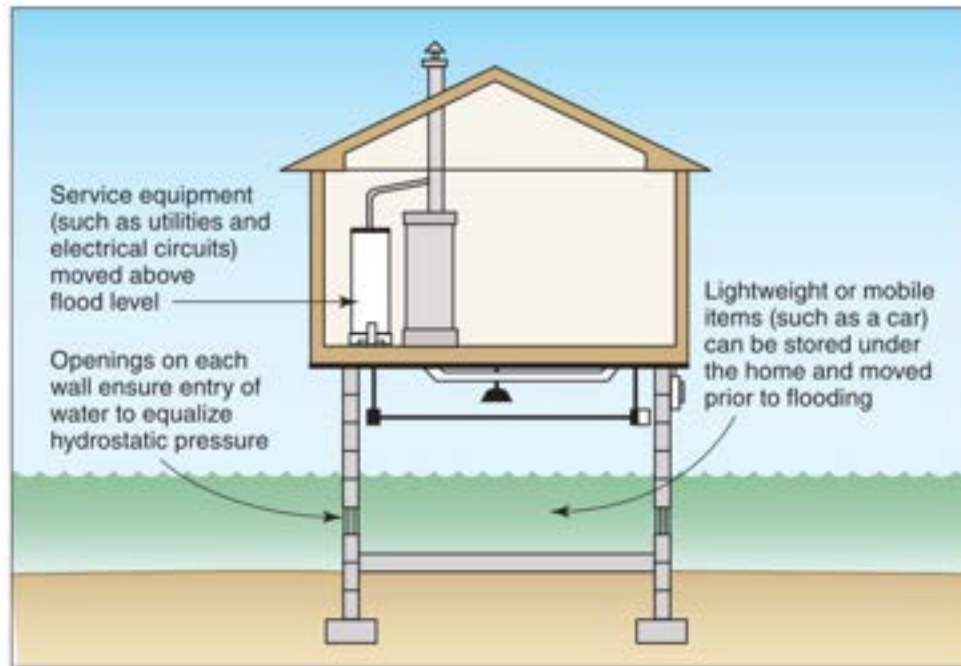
Example cross section of an elevated home using continuous foundation walls (FEMA, 2014).
